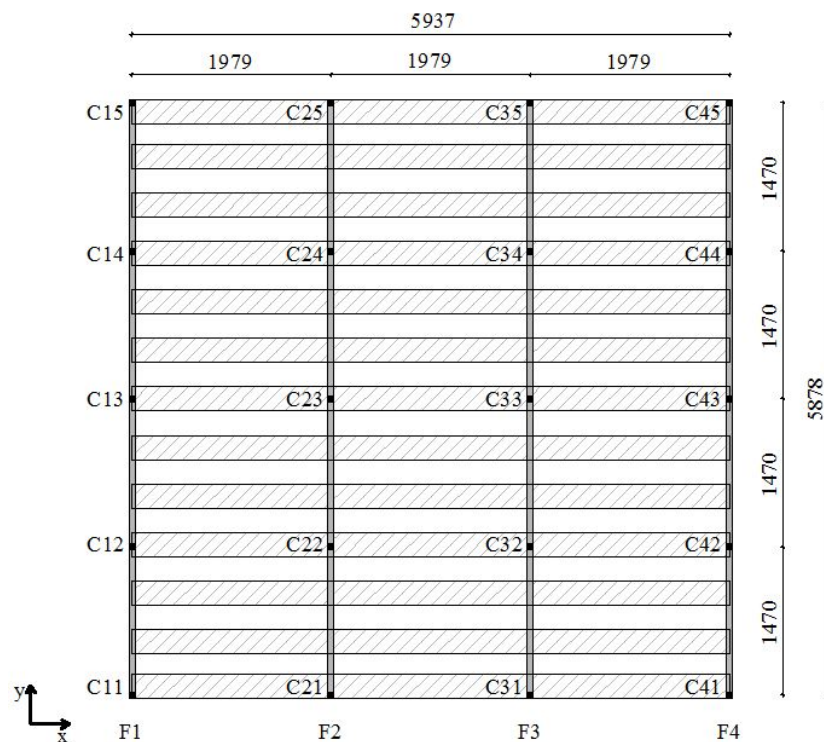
Structure of the building with the frames F1 to F4 and the columns (dimensions in cm).
